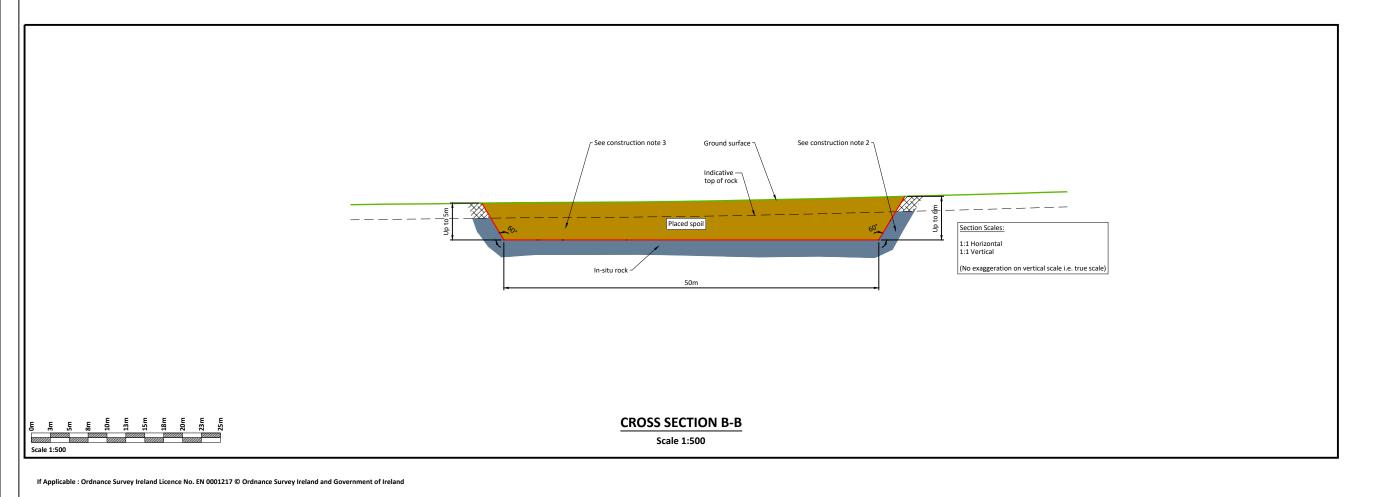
BORROW PIT - PLAN & CROSS SECTION DETAILS
